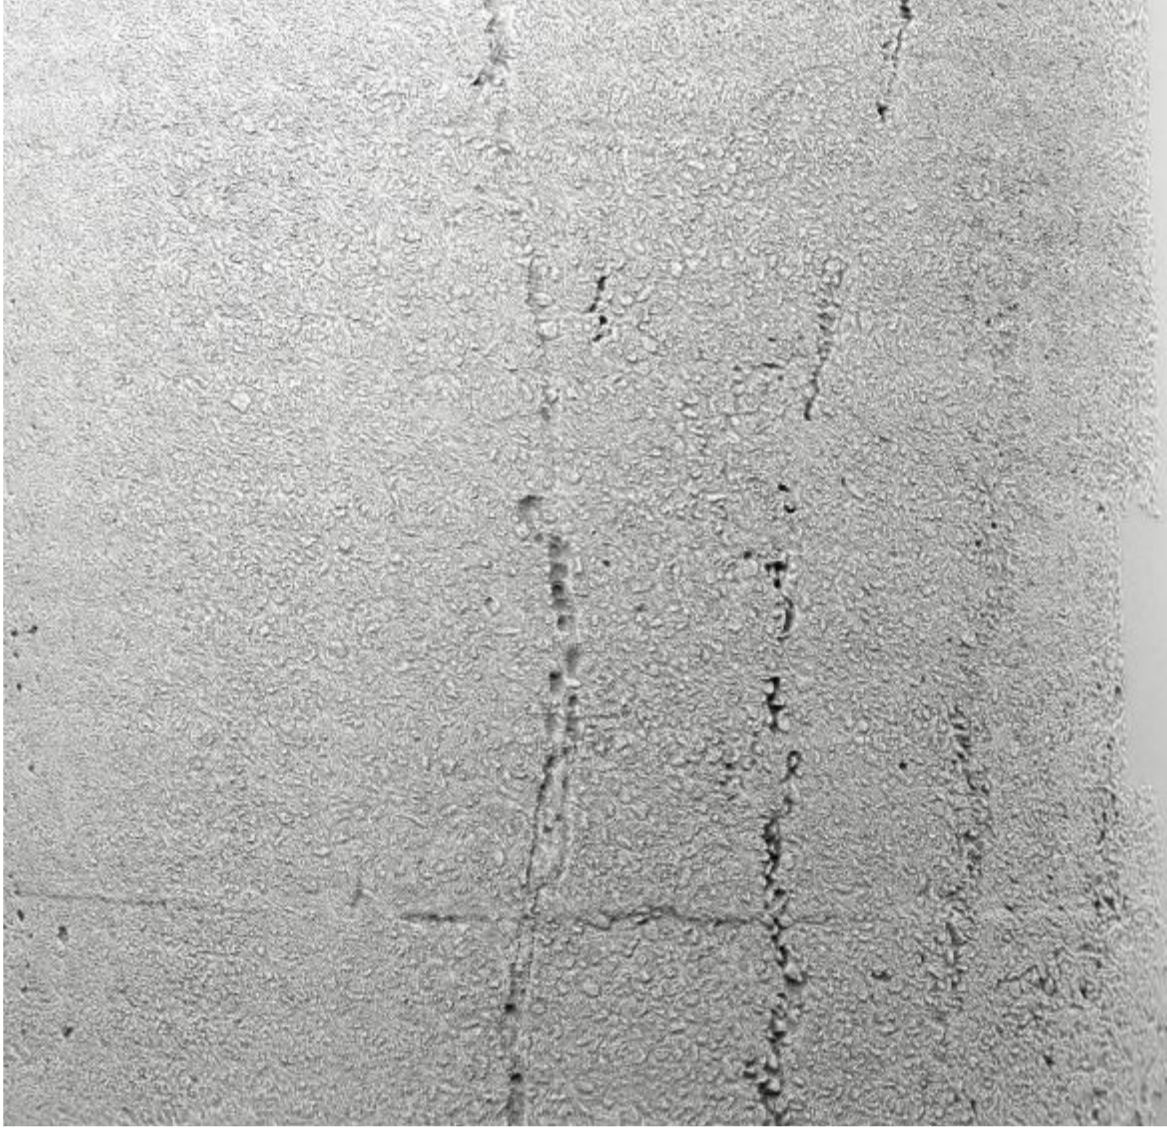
Digital scan of Pier 14, Shaft 2 Caryville Bridge.
